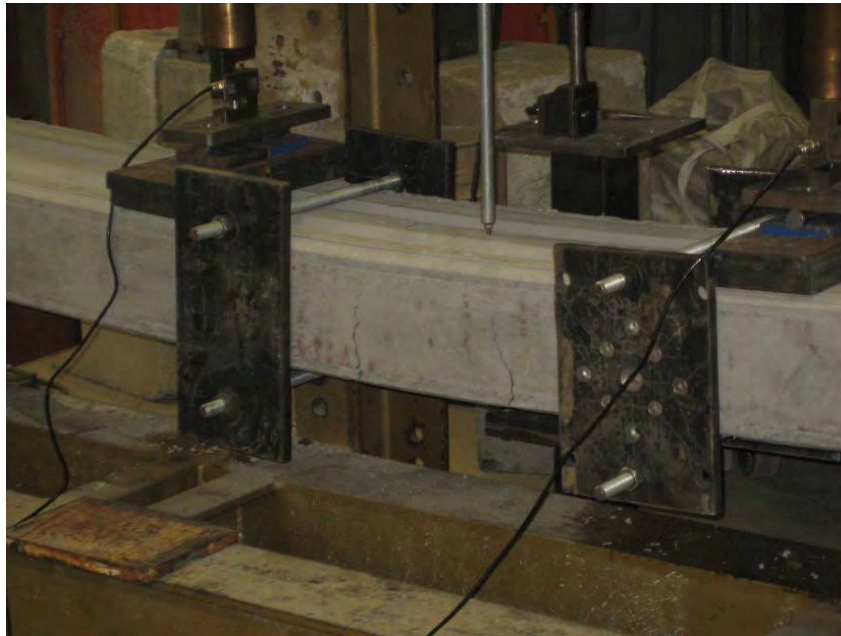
Flexural cracks in Conventional Reinforced Concrete Beam Specimen
